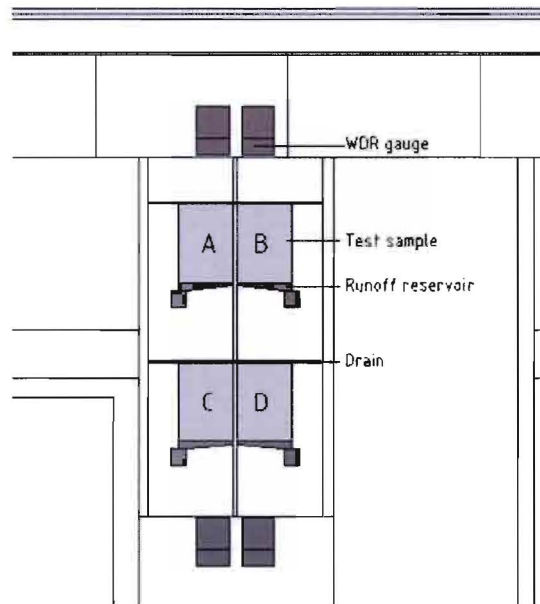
Position of the runoff reservoirs and drains on the test facade.
